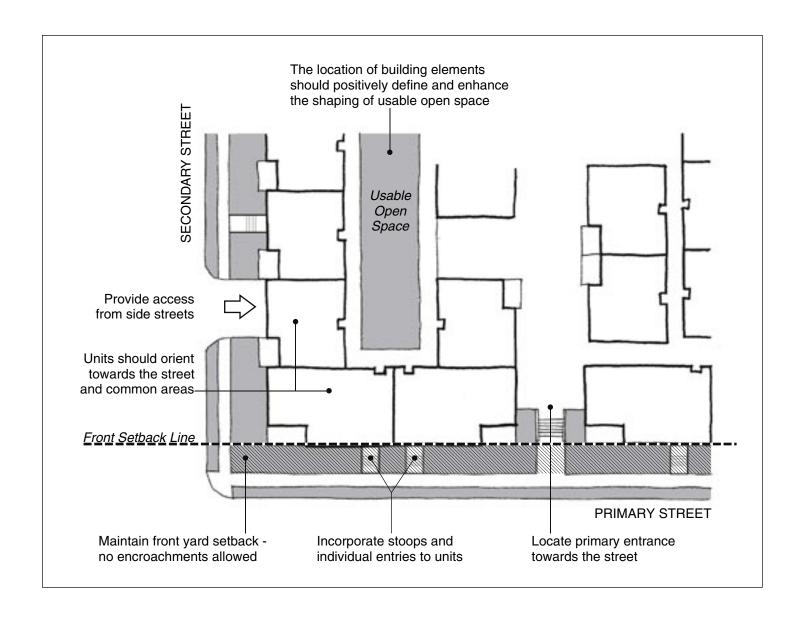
Multi-Family Districts - Orientation and Site Planning Issues
